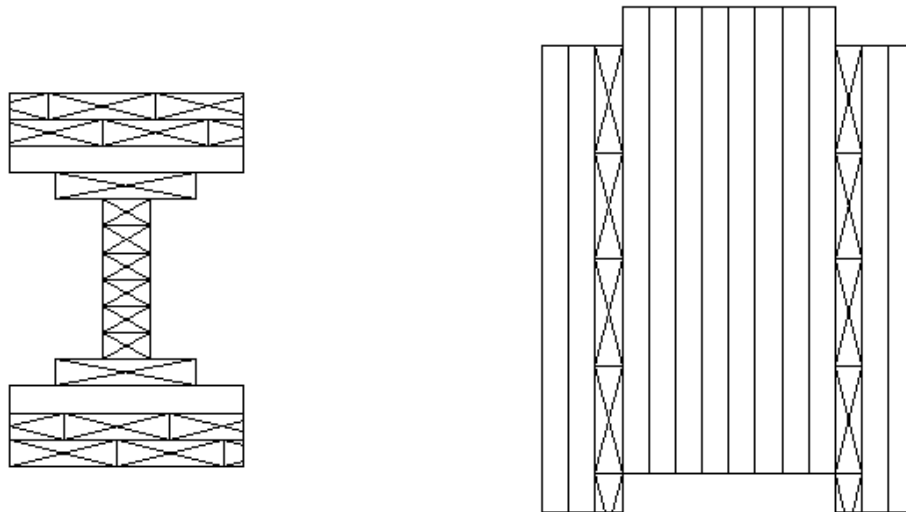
Test #10b – Glue Bond with MF with 2x8 Spreader Board
